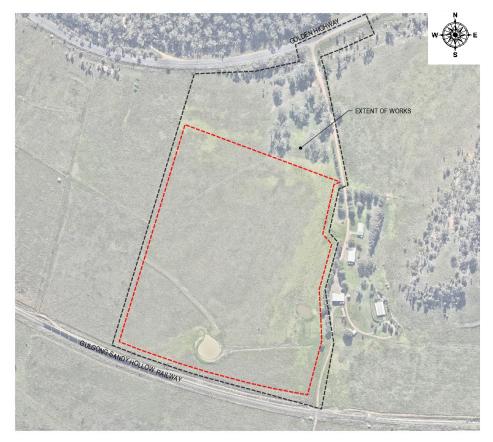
Site Location Plan (Source: Nearmaps 2023)
